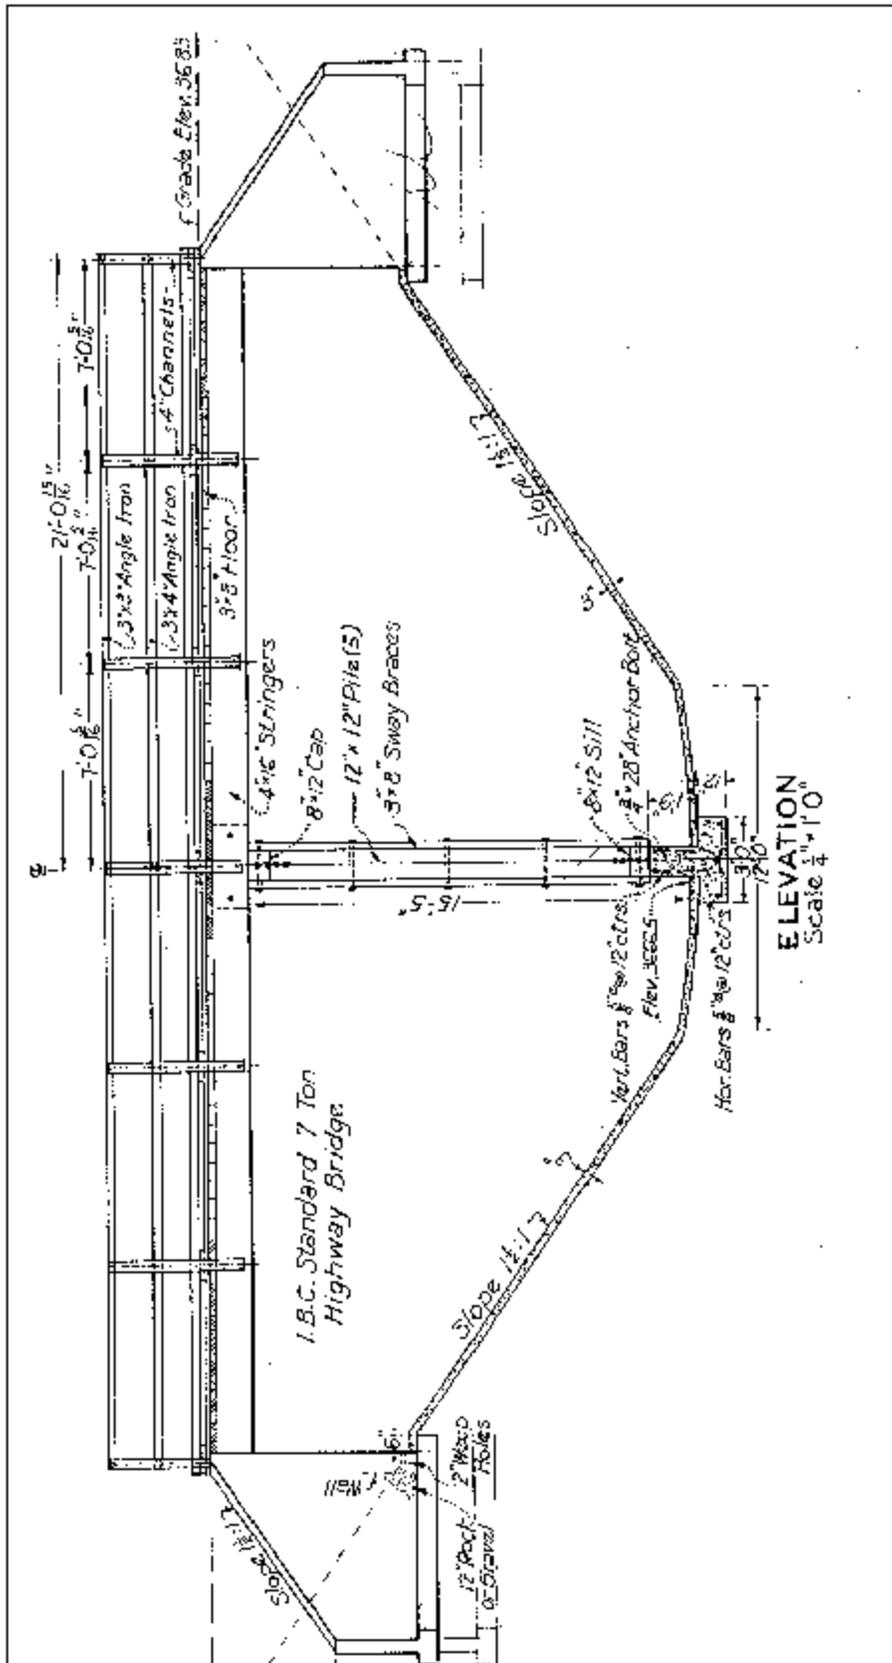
Cross-section of Standard 7-ton IBWC Bridge.
